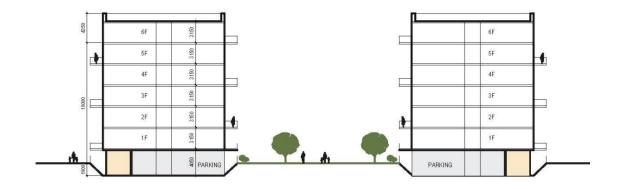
e – Apartment Block Section, Sunken Car Parking
